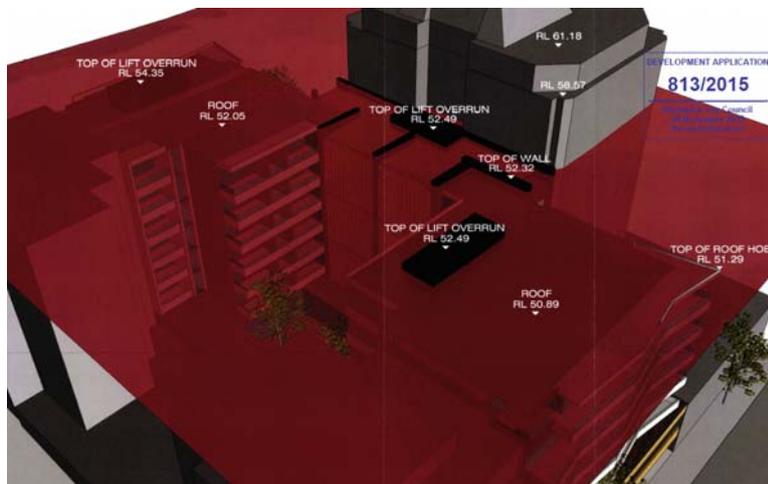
Height plane (red) showing the extent of JRPP-approved height variation associated with the lift overrun fronting Green Street and the central lift overrun and surrounding walls.
